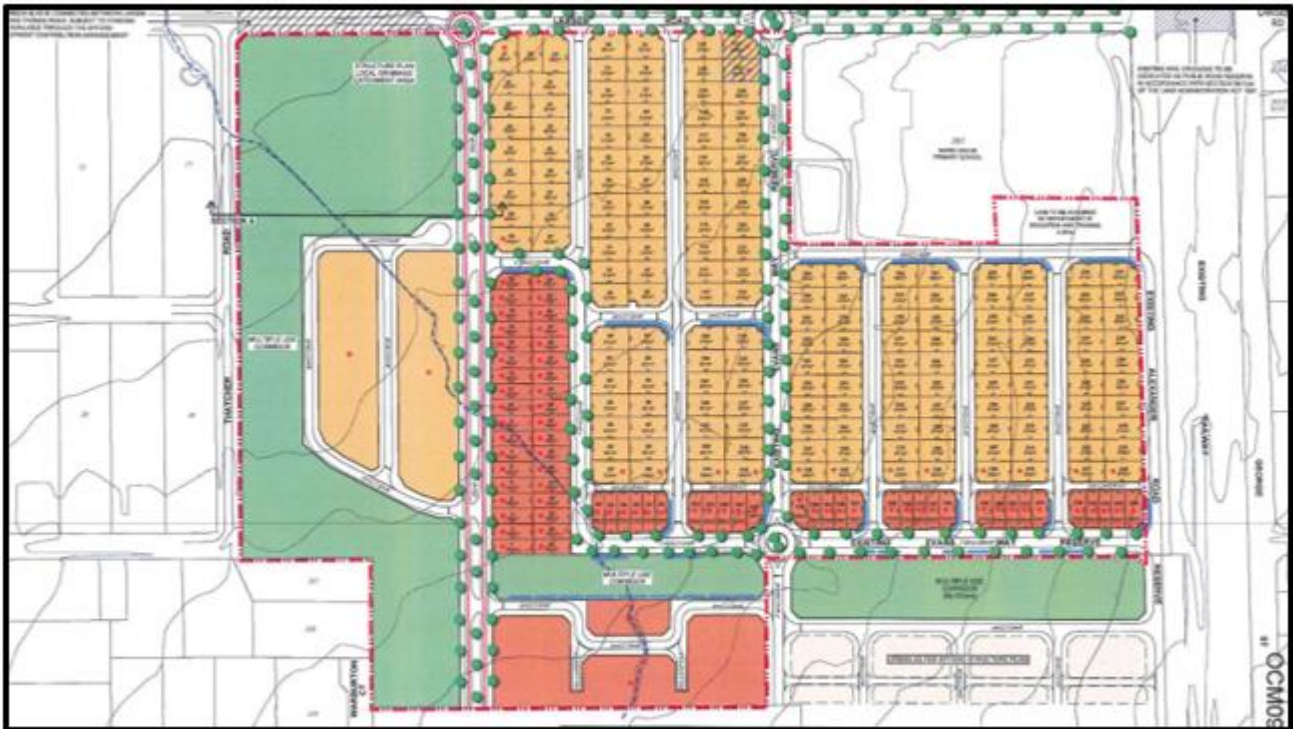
Density Code Plan for Subdivision Approval WAPC 1157749
